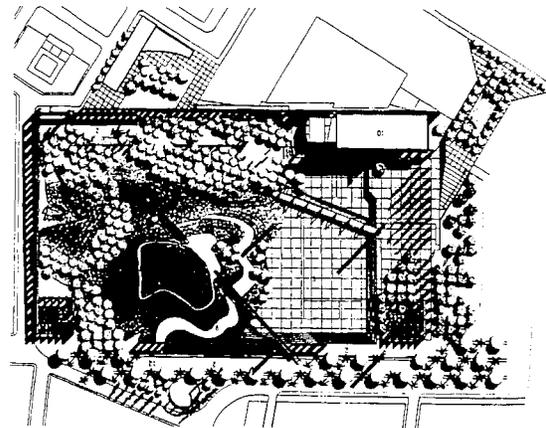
Site plan, Parc du Clot, Barcelona, 1988
